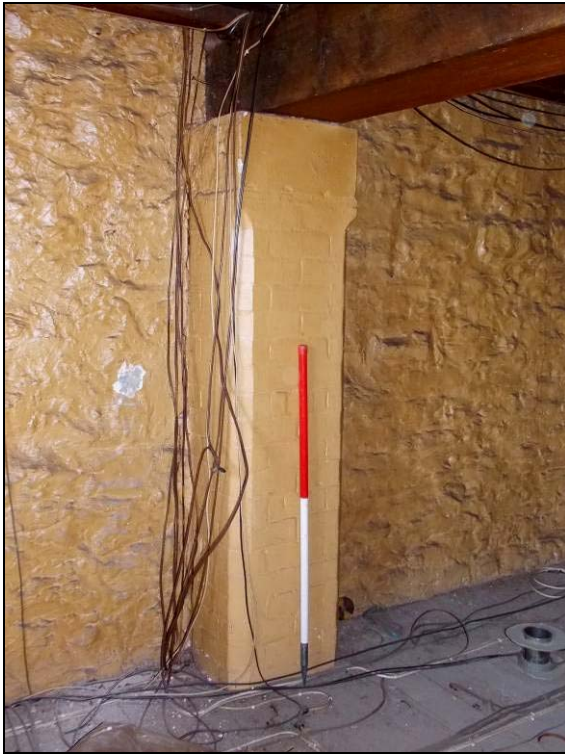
Detail of pilaster, looking south-west (scale 1m).
